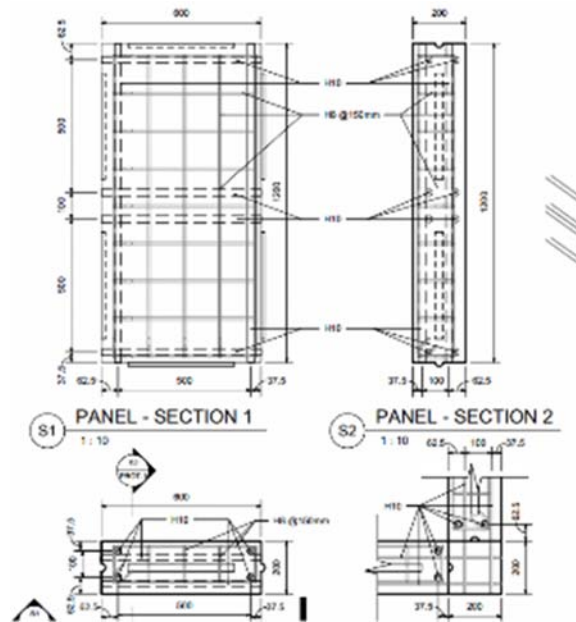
Precast concrete module for the DfD/R prototype
